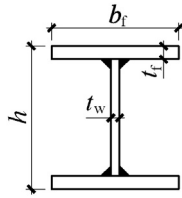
Specimen sectional dimensions. h : section depth, b_f : flange width, t_w : web thickness, and t_f : flange thickness.
